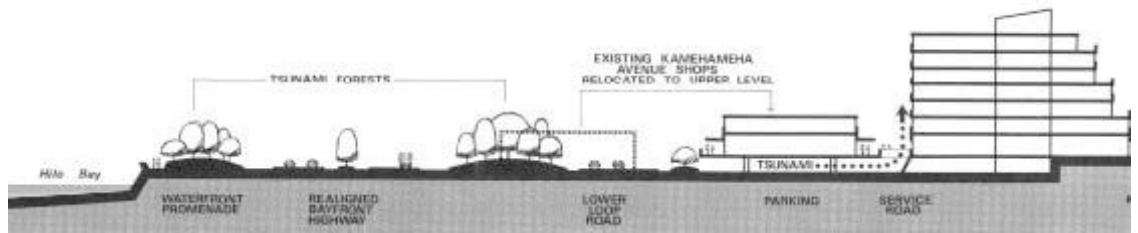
Hilo Bayin Hawaii Reconstruction Plan after 1960 Tsunami
